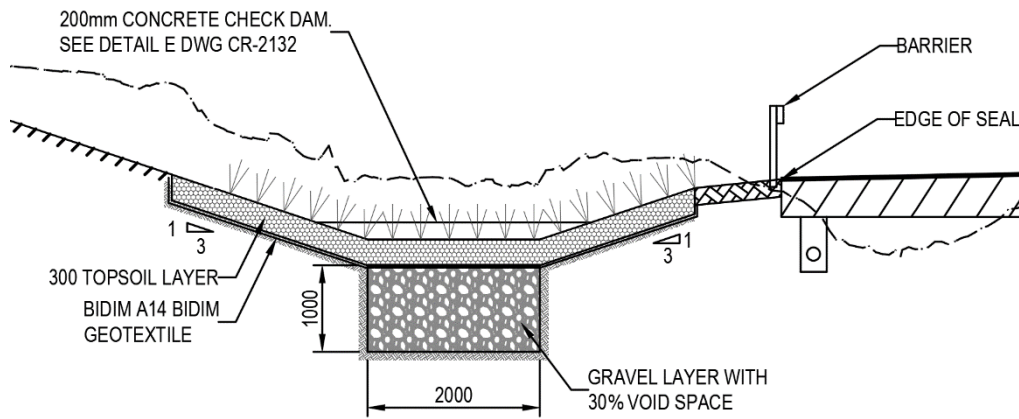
Proposed bioretention swale section (Modified, source: GD01)
